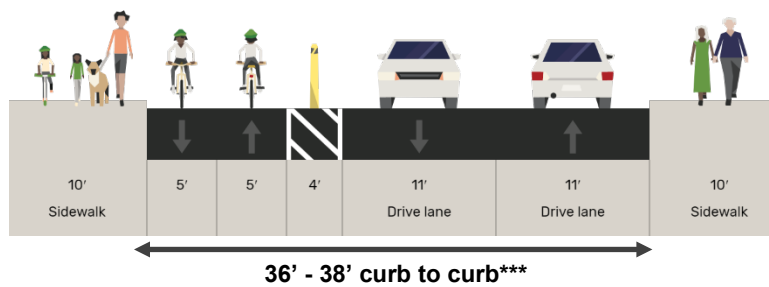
Section B (Butler Street – Sawyer Street to 62nd Street) – Proposed Option 2
